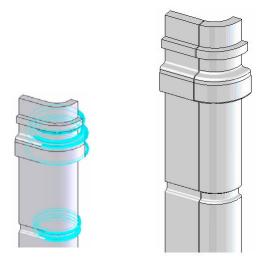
Incorrect geometry of Unit 5 in Revit Building
